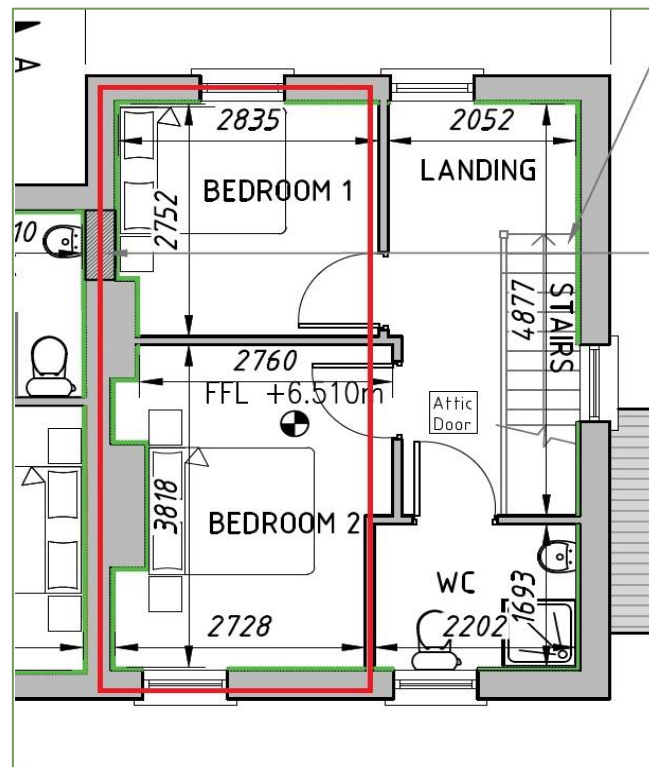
Provisional extent of attic which will be dedicated to roosting bats (outlined in red).
